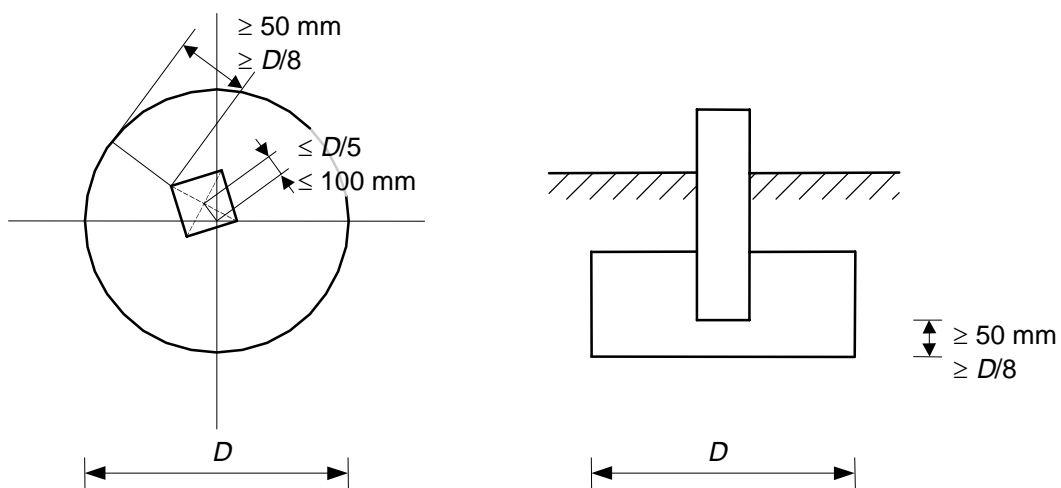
Position of the prefabricated foundation pile within the foundation hole
